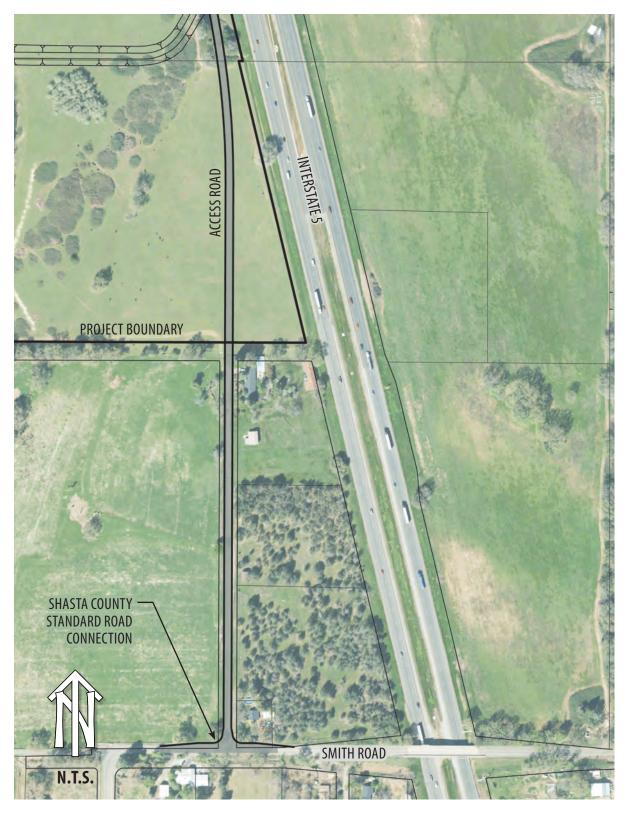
PROPOSED PROJECT SOUTH ROAD CONNECTION
